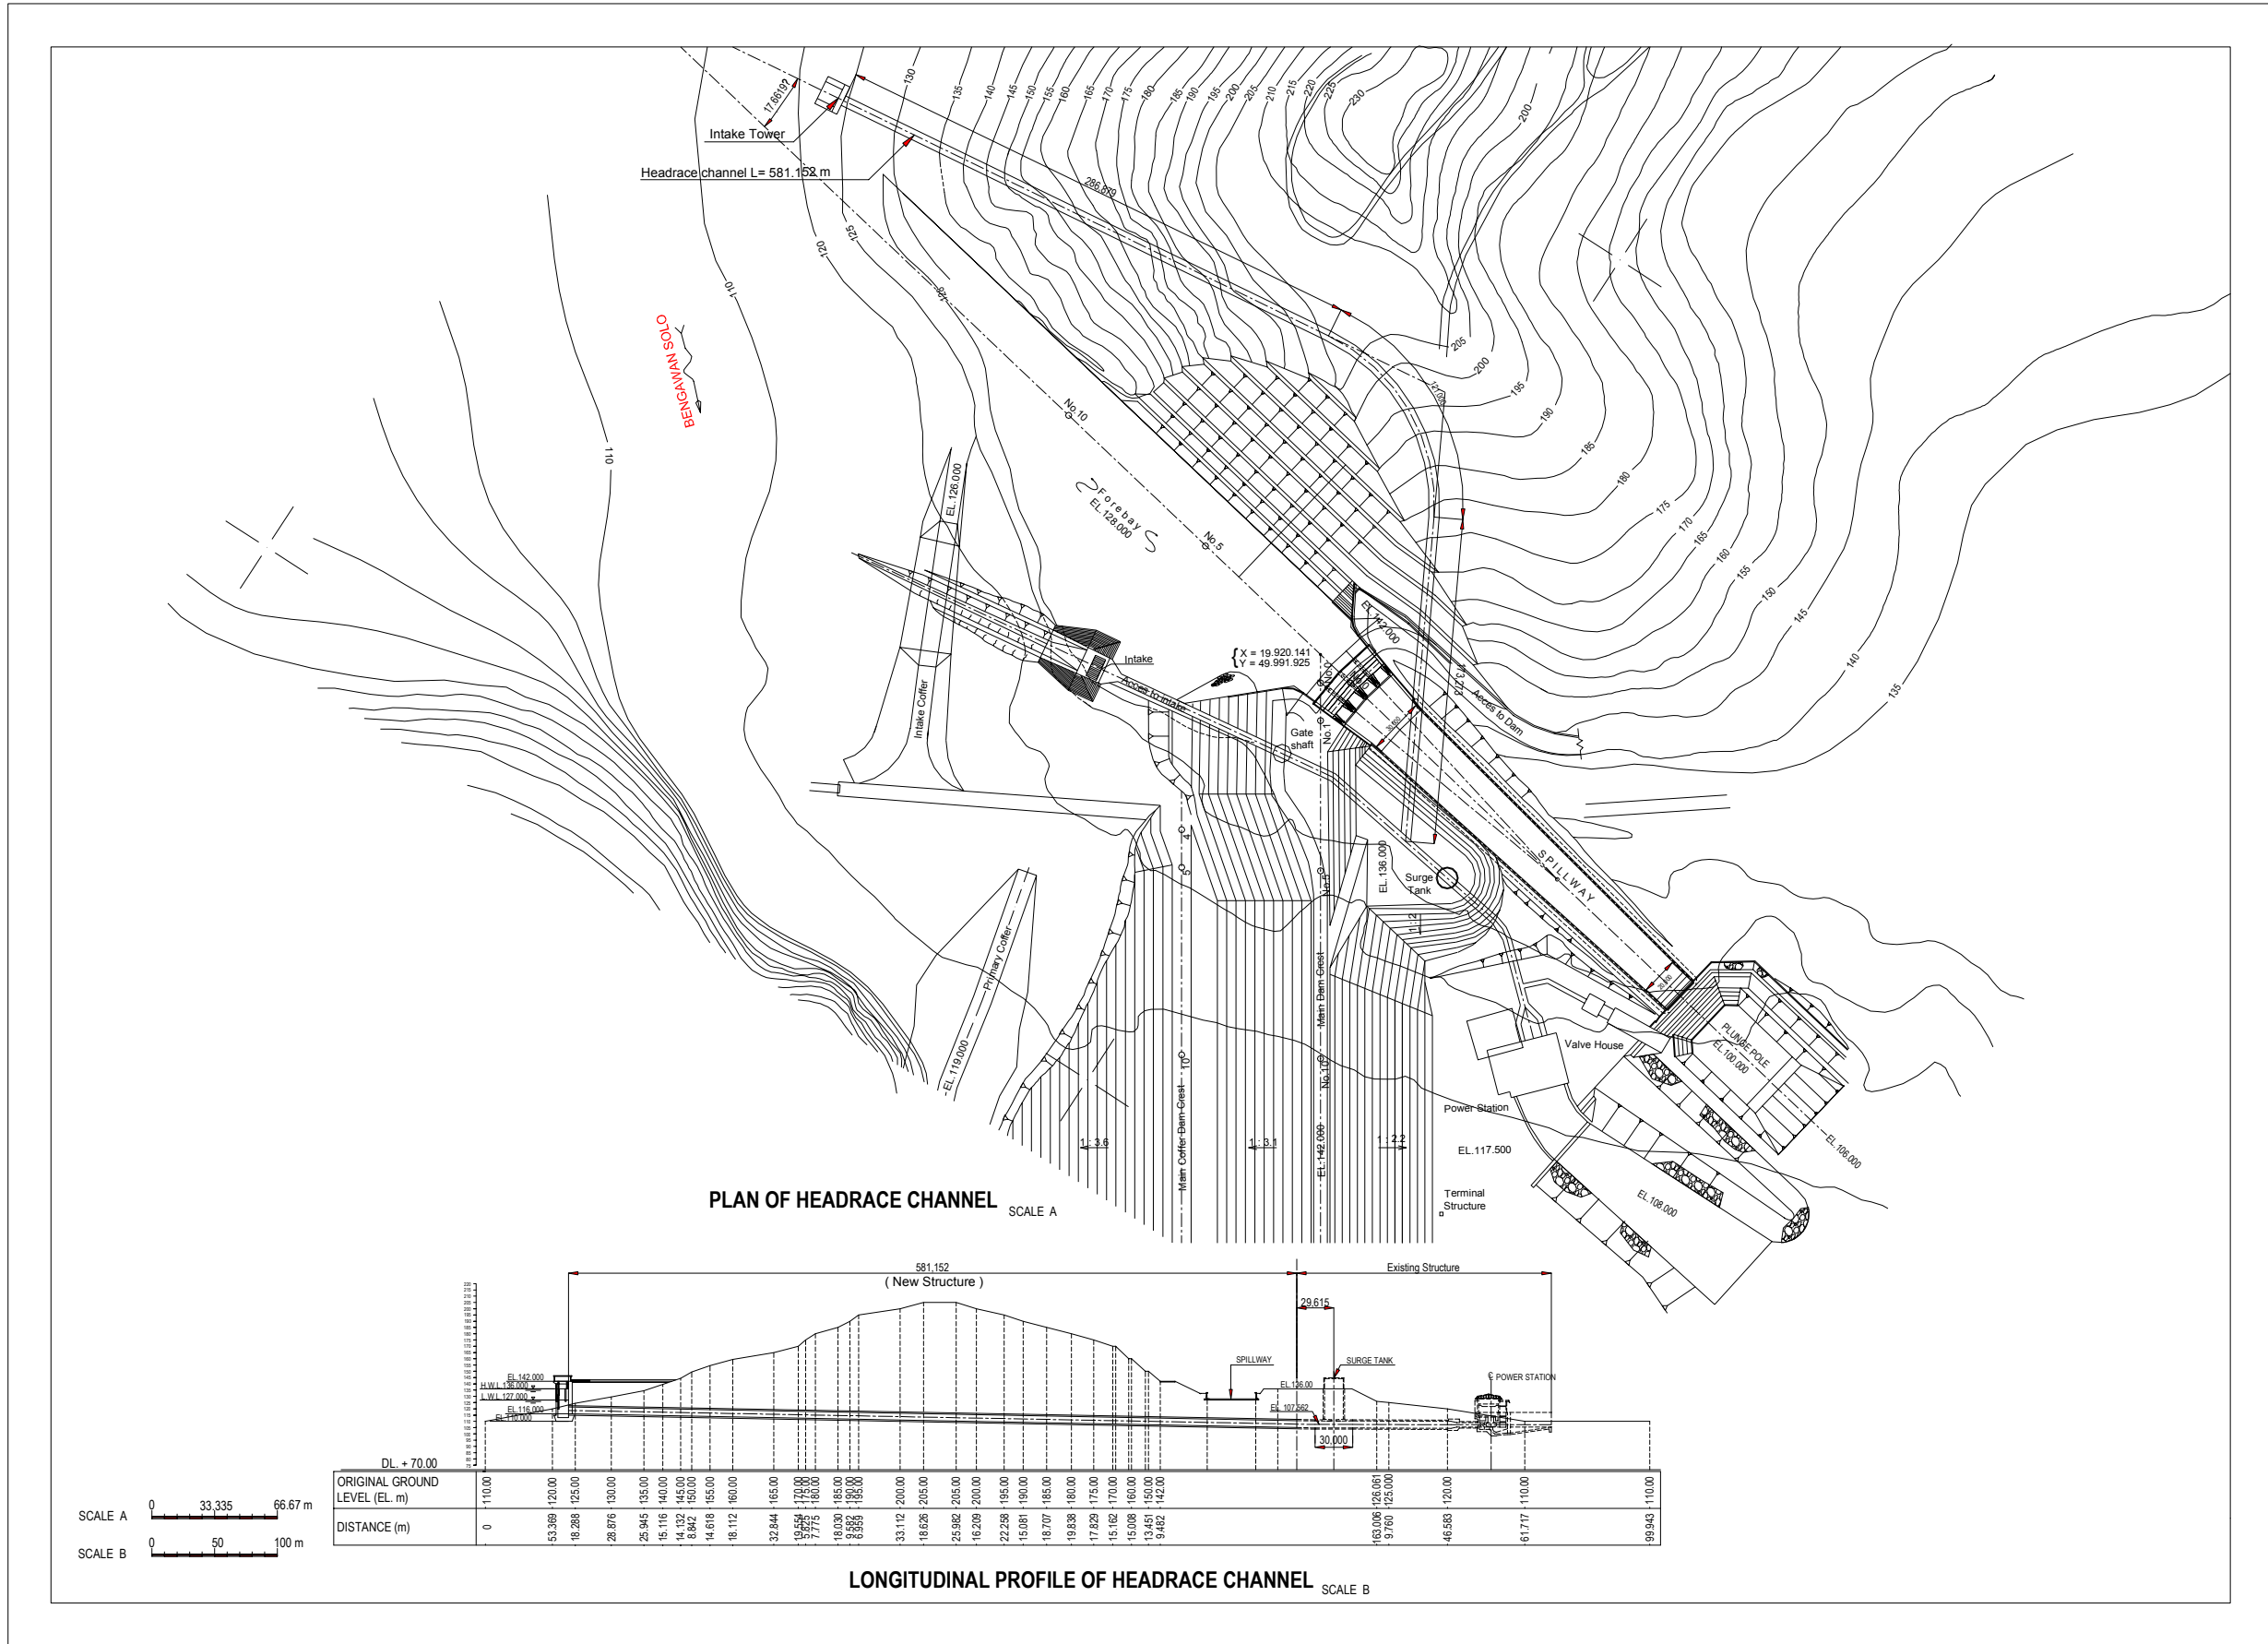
Layout Plan and Profile of Relocation of Intale
